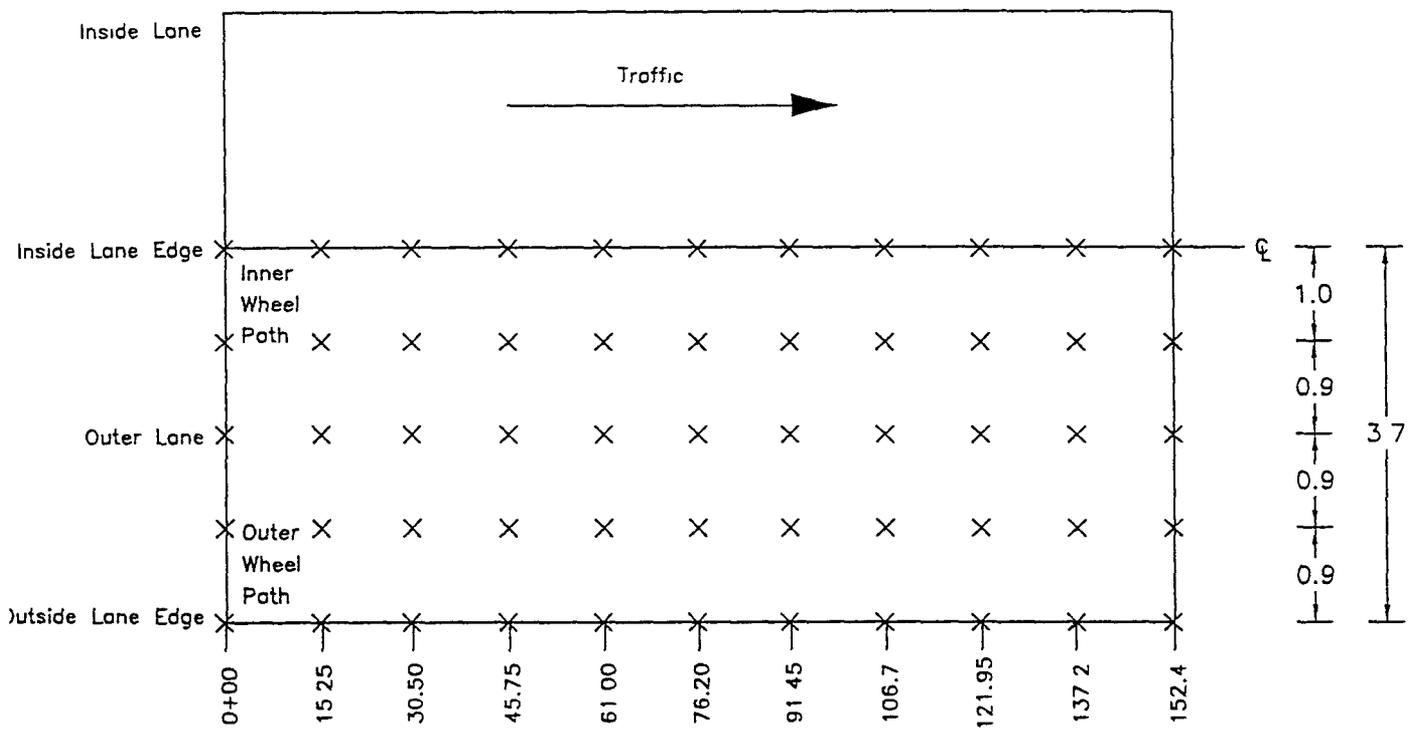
Test section elevation measurement locations for SPS-8 Washington.
